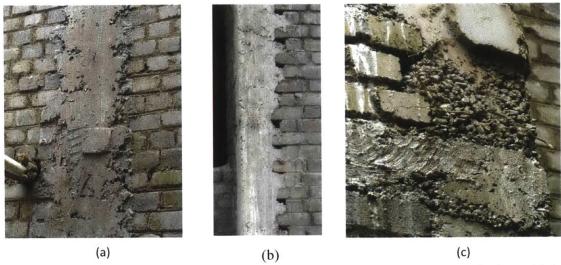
CM construction at the new IIT Gandhinagar campus: concrete seapage results in unsightly conditions (a), contrastingly, inadequate filling of tie-columns results in less bonded area between concrete and masonry (b), and separation of cement and aggregate weakens beam-column joints (c).
